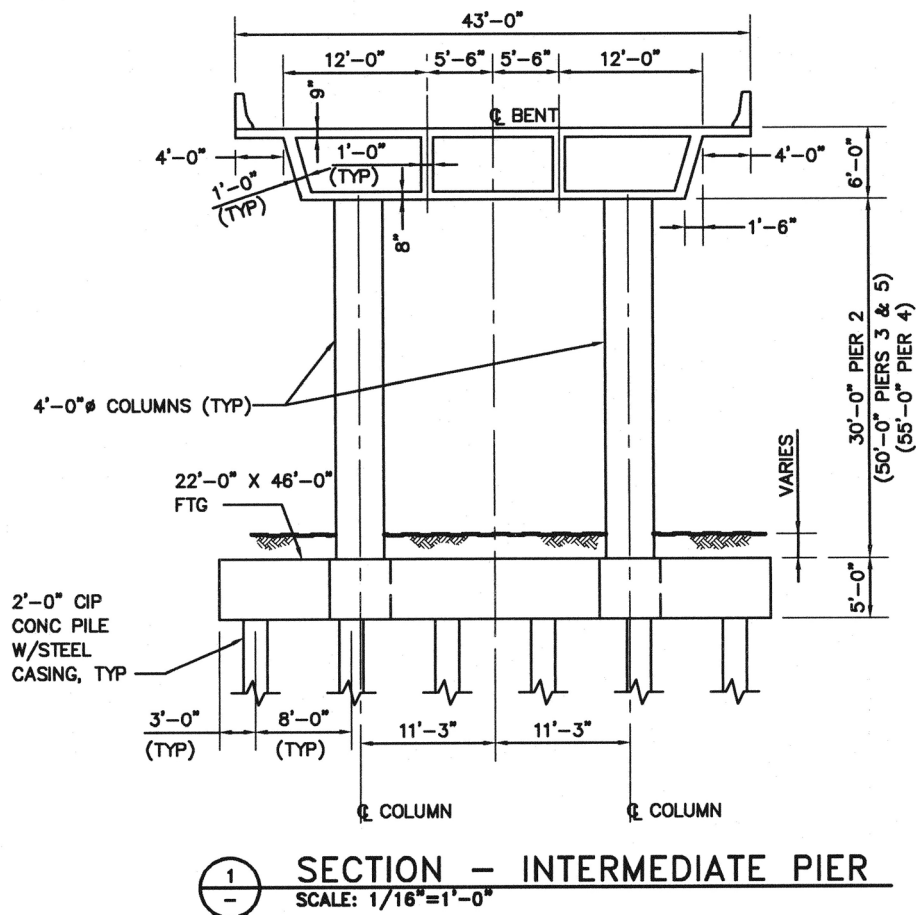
Elevation of an Intermediate Pier, Washington State Bridge
